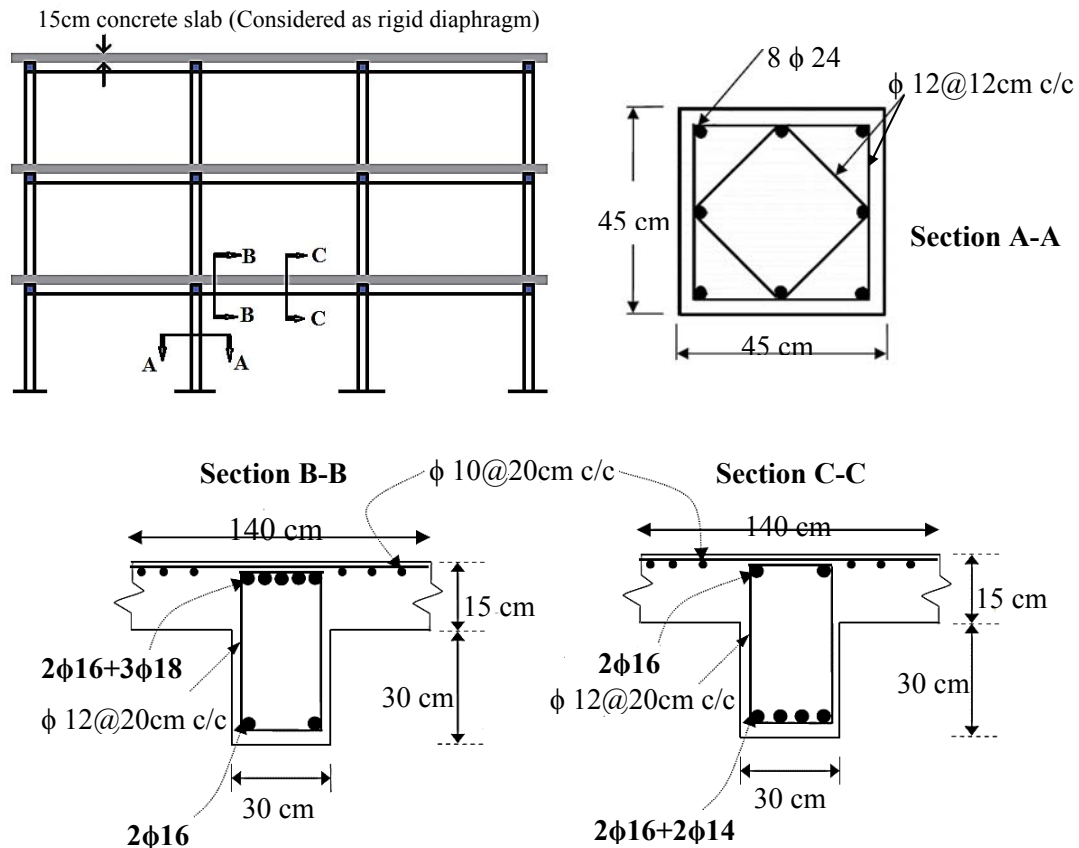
Cross-sections and reinforcement details for beams and columns for 3S3B-E frame (class 3)
